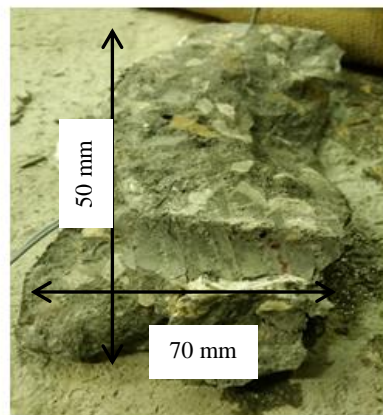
Bottom face cracks of beam confined with internal transverse reinforcement
